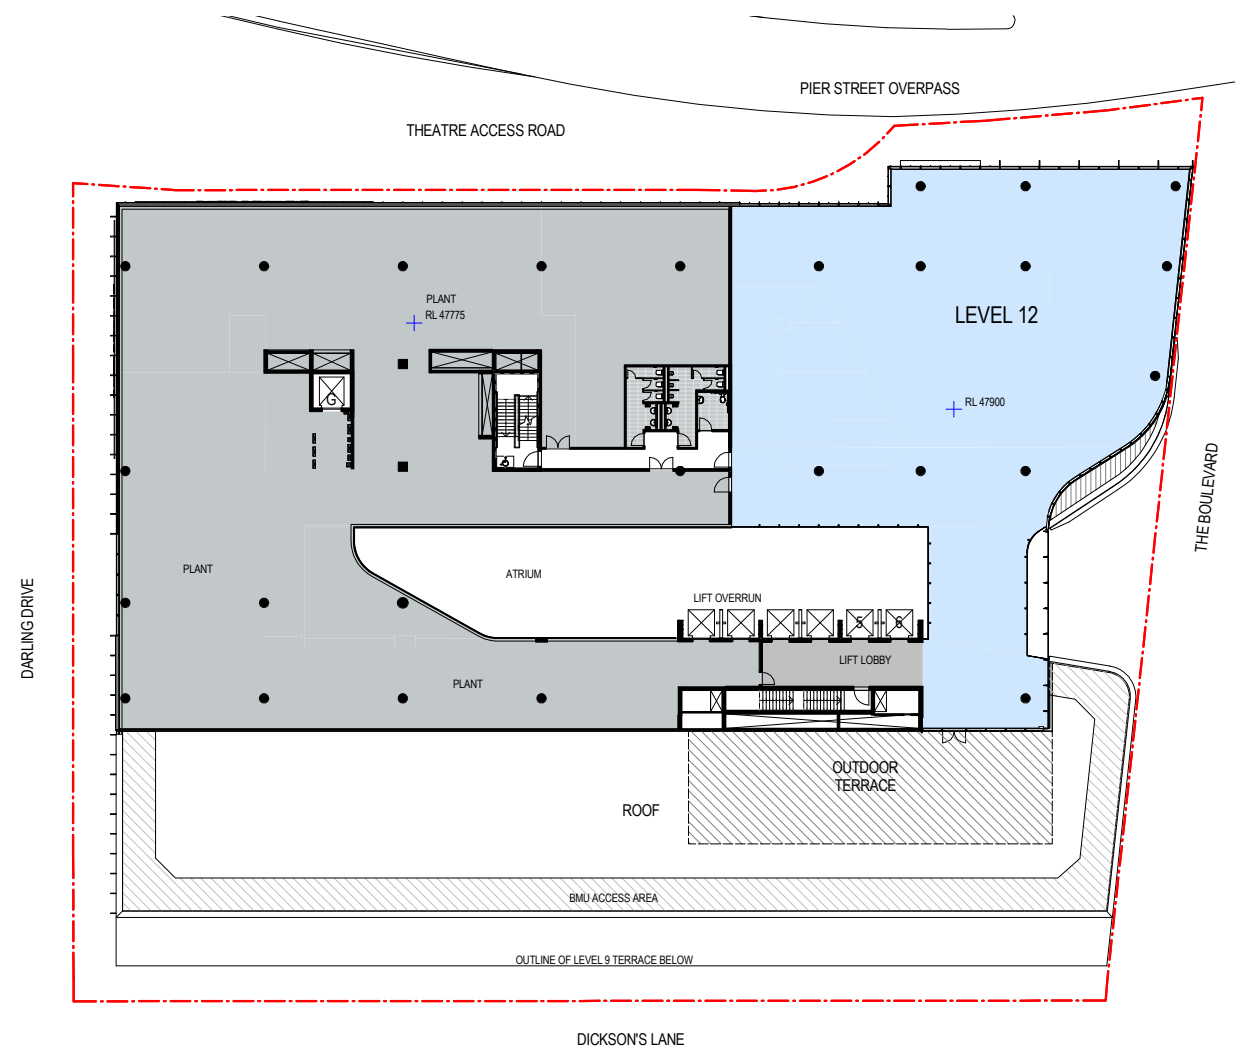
Section 96 NW Plot proposed Level 12 Plan
